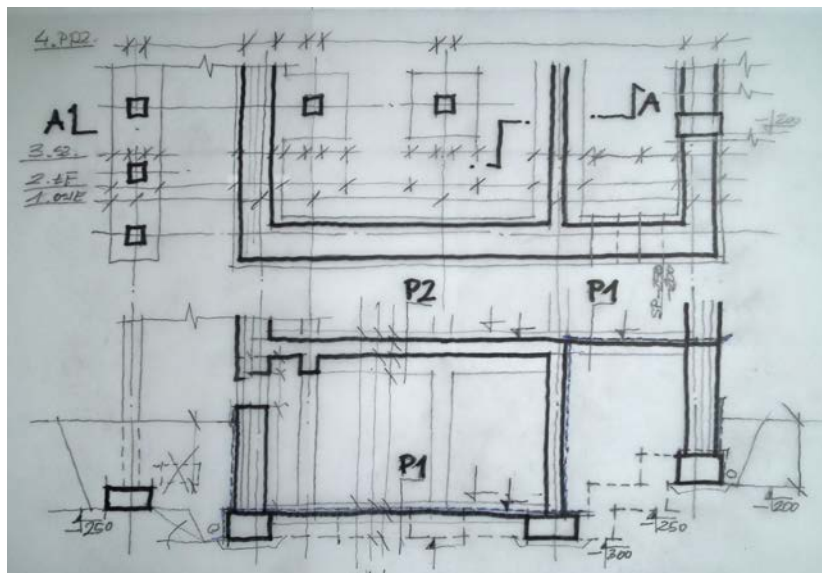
Foundation plan and section: 1) axes; 2) footings; 3) detailed measurements; and 4) relation to other drawings (basement plan). Important is not the final shape of drawing, but its slow emerging (see explanations in the article).
